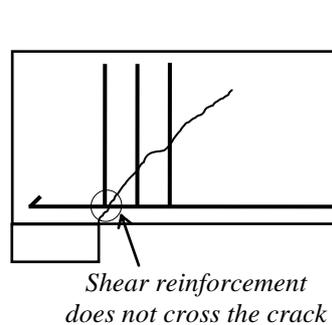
If shear reinforcement is placed too close to the support, it might miss the crack and therefore be inefficient.
